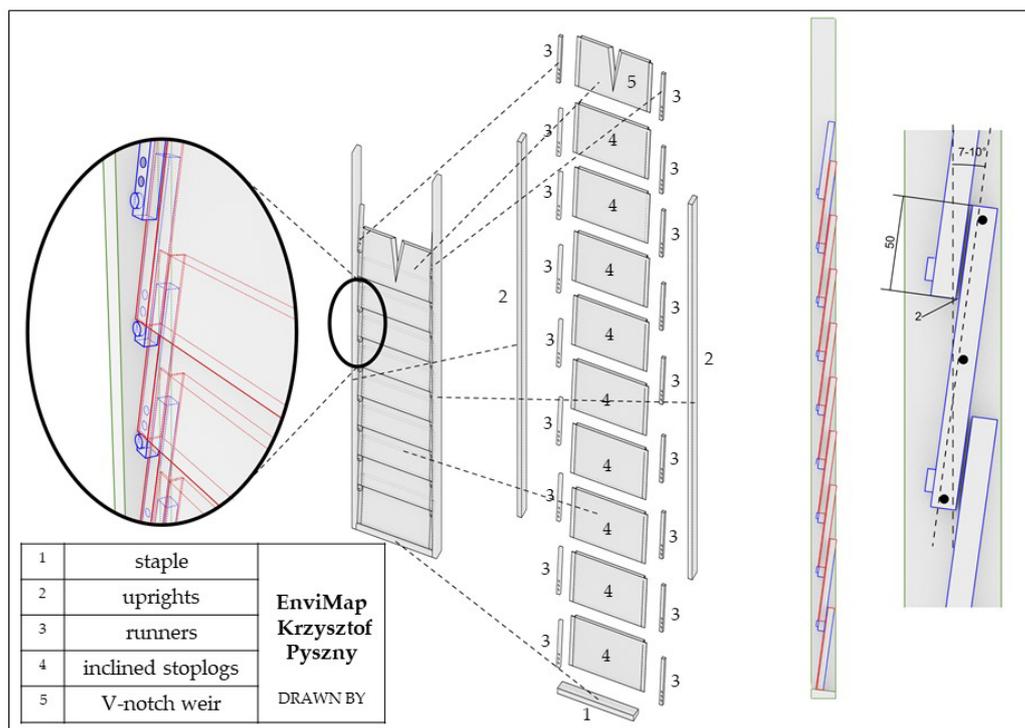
Assembly drawing of the WCS using individual strips as a truck element to fasten boards.
